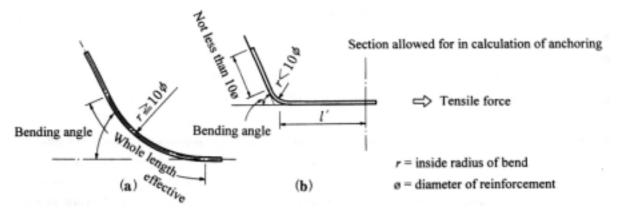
Determination of development length of reinforcement in bent anchorages
